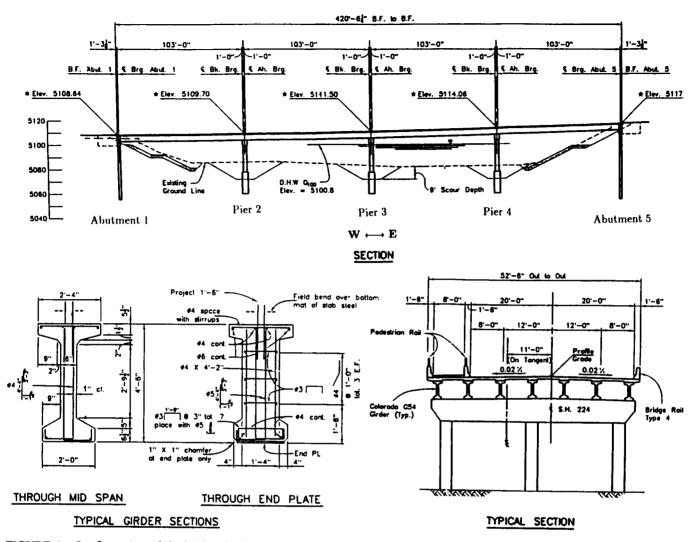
Configuration of the bridge deck (1 in. = 25.4 mm).
